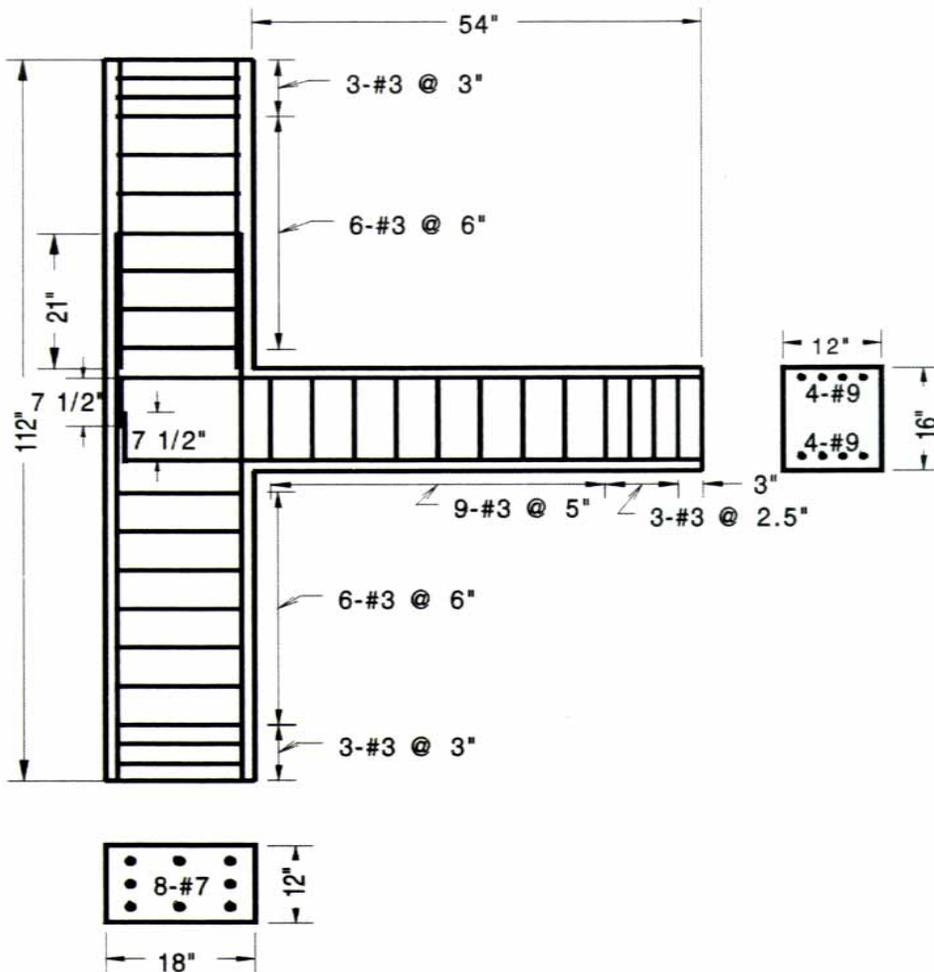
Specimen Dimension and Reinforcement Details (Clyde et al. [9])
